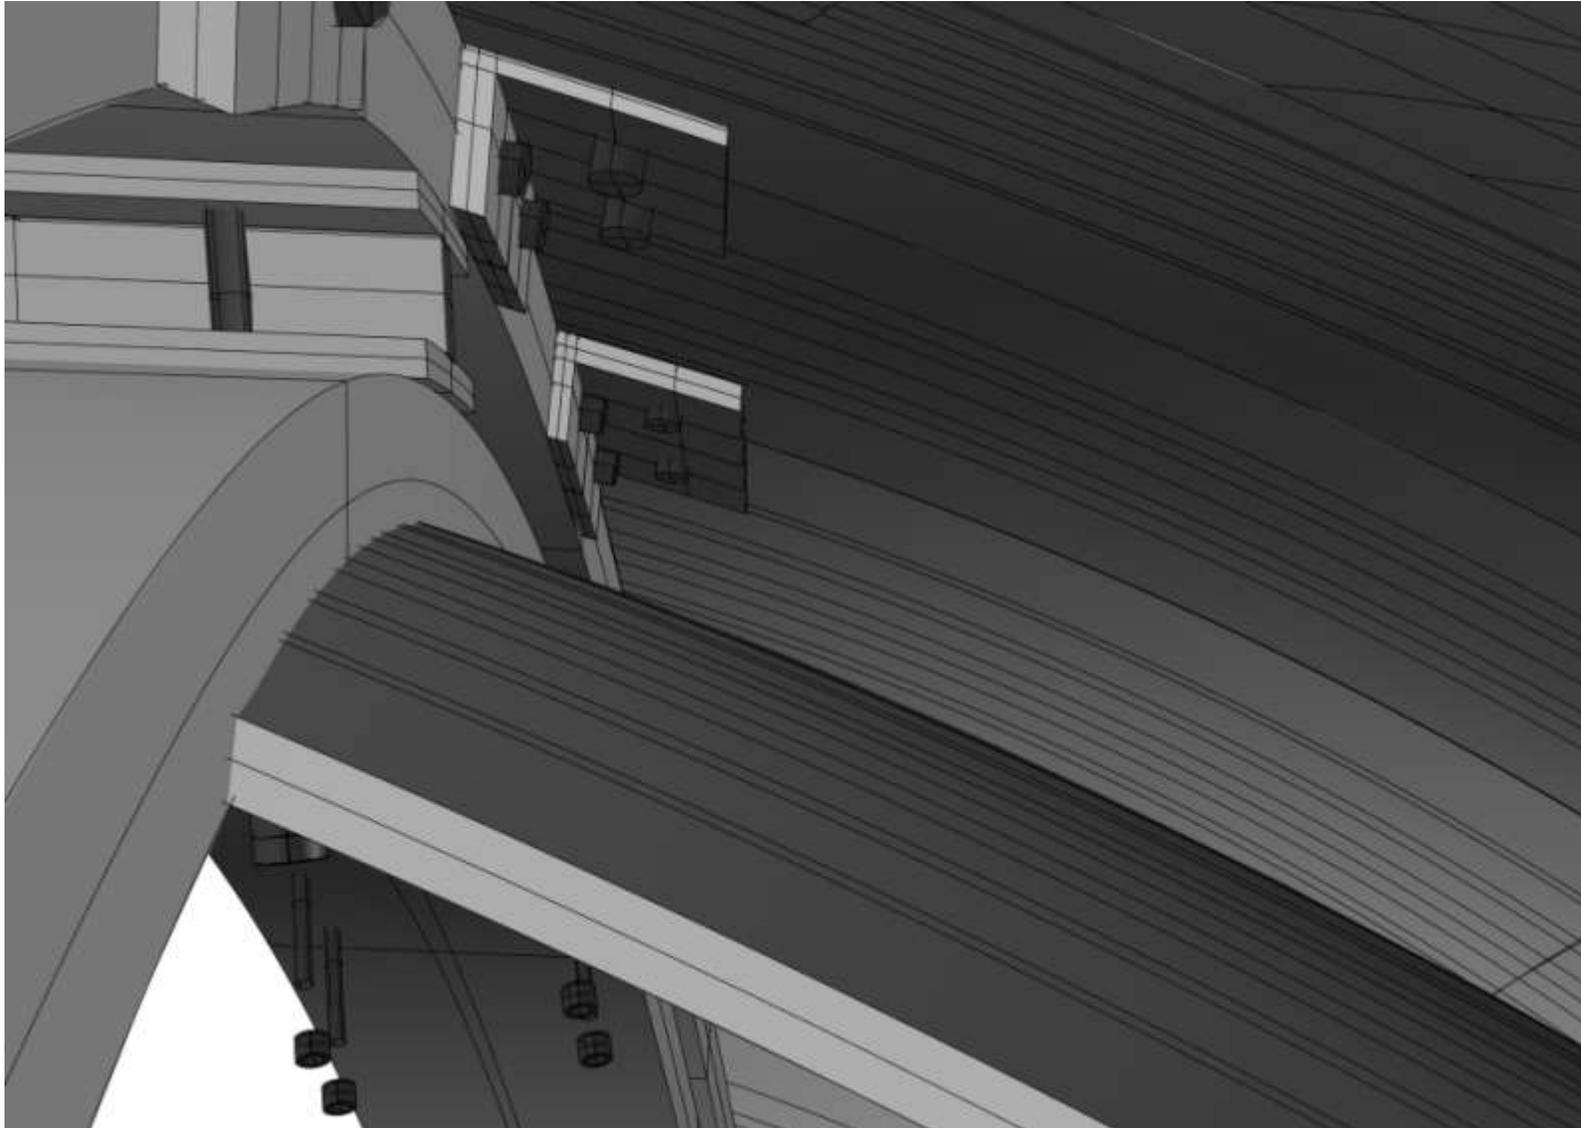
The diagram Shows how the wall panels install on the structure, and how they are connected to the wall structure
